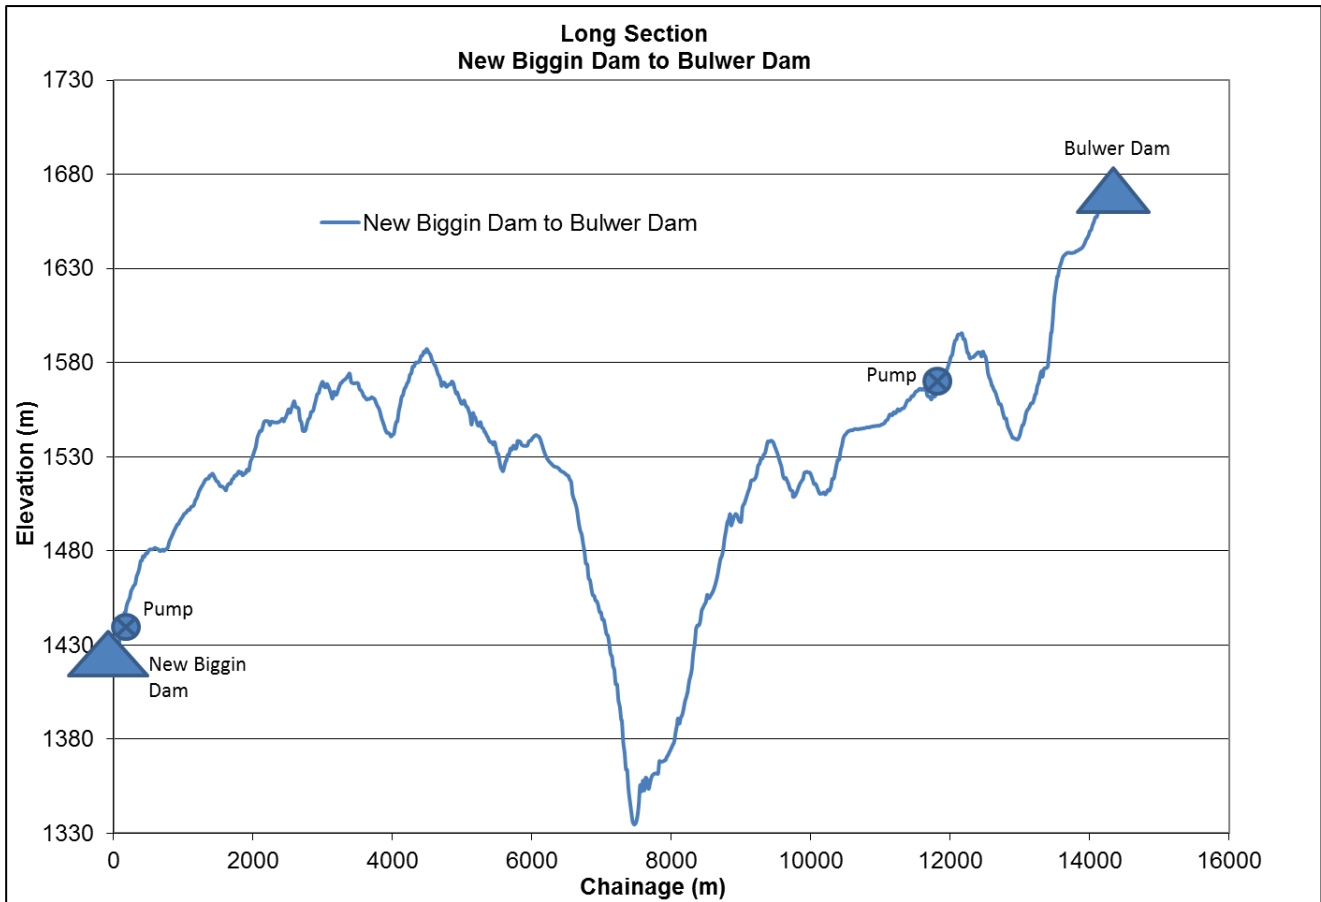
Long Section - New Biggin Dam to Bulwer Dam
